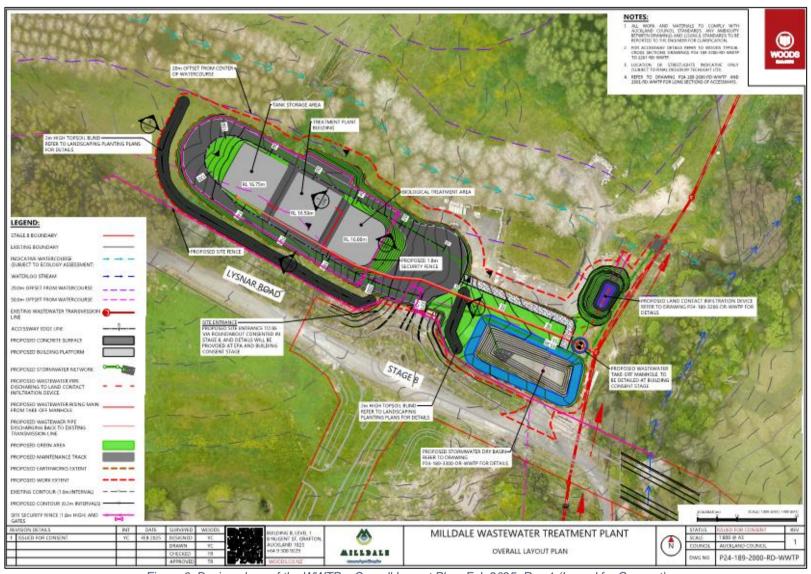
Design plans of the WWTP - Overall Layout Plan, Feb 2025, Rev 1 (Issued for Consent)
